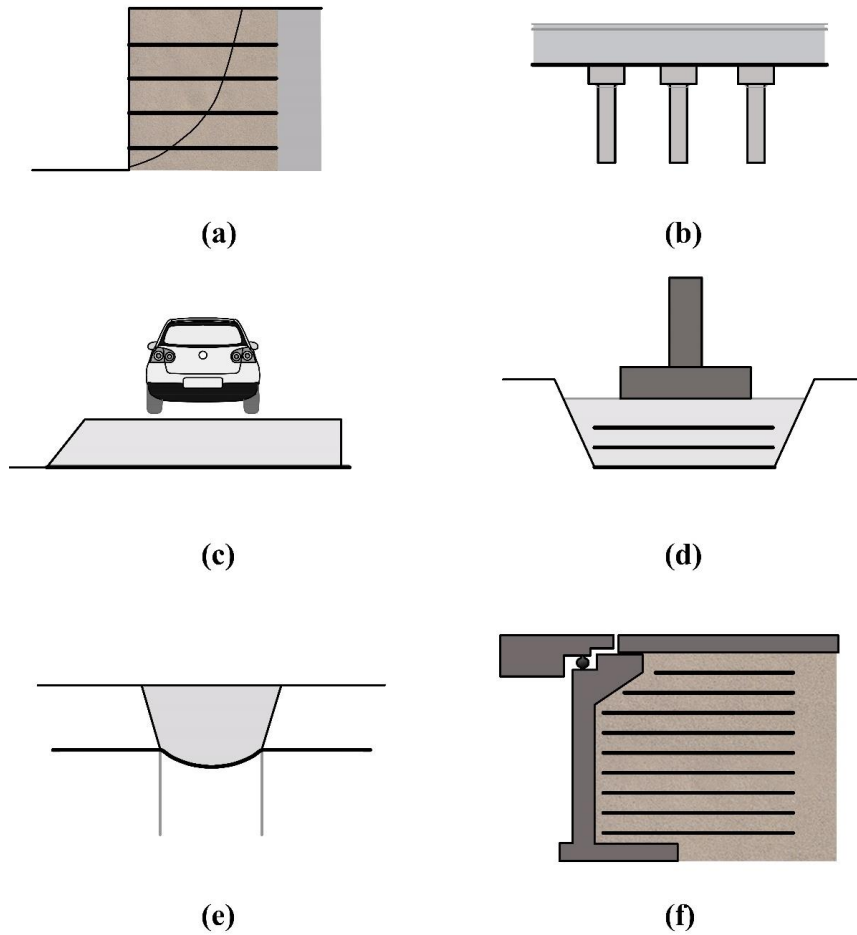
Different applications of MSE in geotechnical engineering (a) Retaining walls; (b) pile foundations; (c) road bases; (d) shallow foundations; (e) sinkhole bridging; and (f) abutments.
